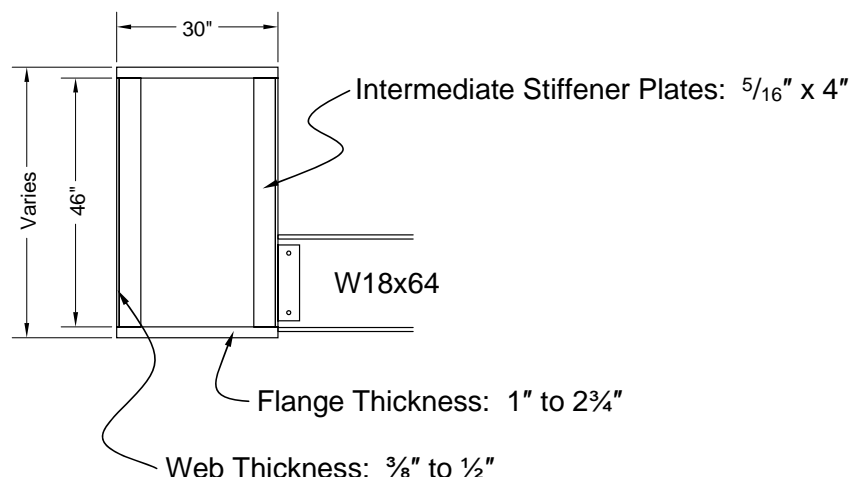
Dimensions of Longitudinal Box Girders in 12th Street Exit Ramp
